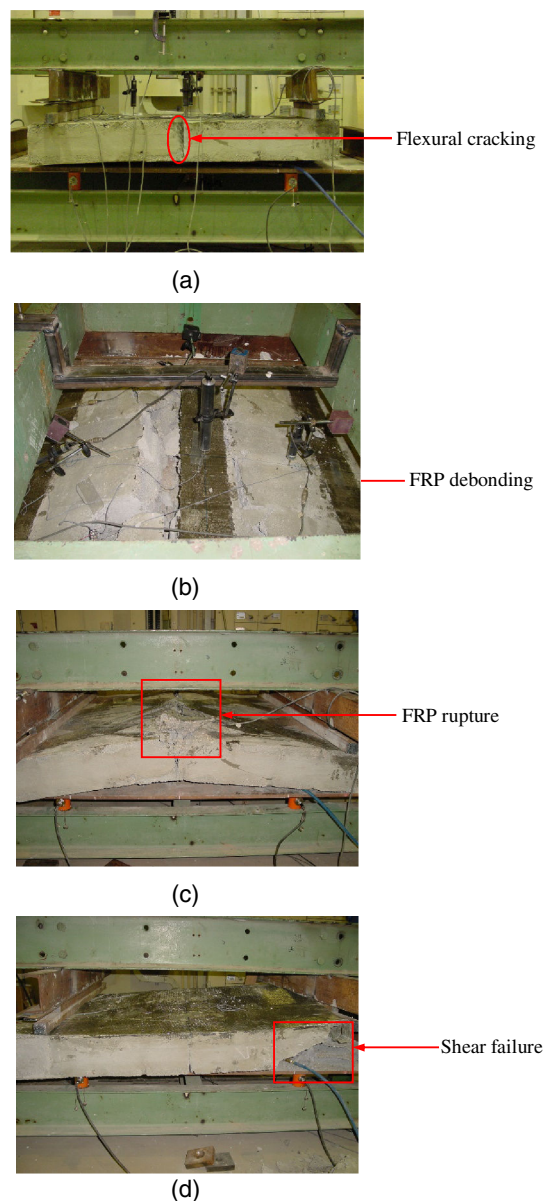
Mode of failure for representative samples of test walls: (a) control wall WC; (b) Wall W1; (c) Wall W3; (d) Wall W5
